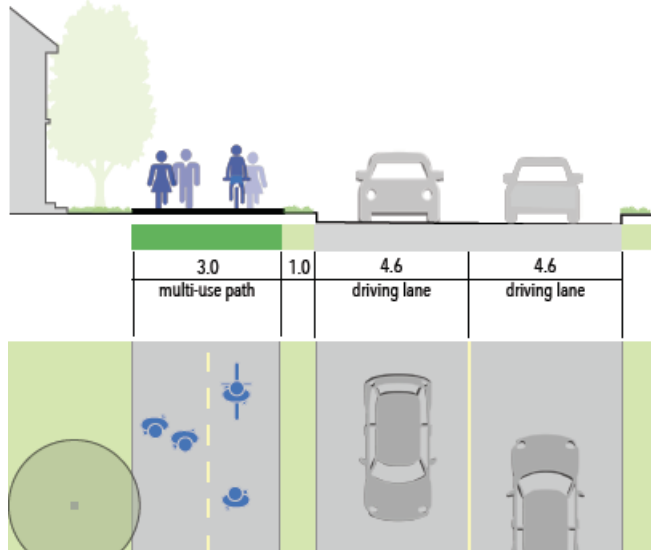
Treaty Trail & Truro Heights Road, Proposed Cross Section
